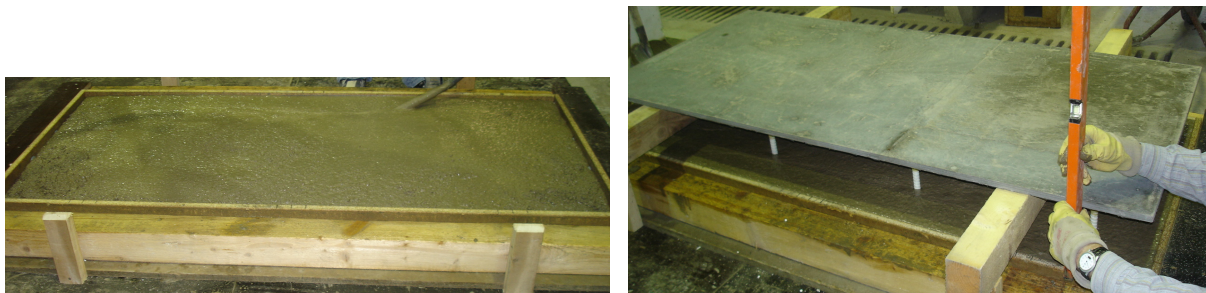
Facade with anchor array placed into fresh normal concrete without thermal insulation
